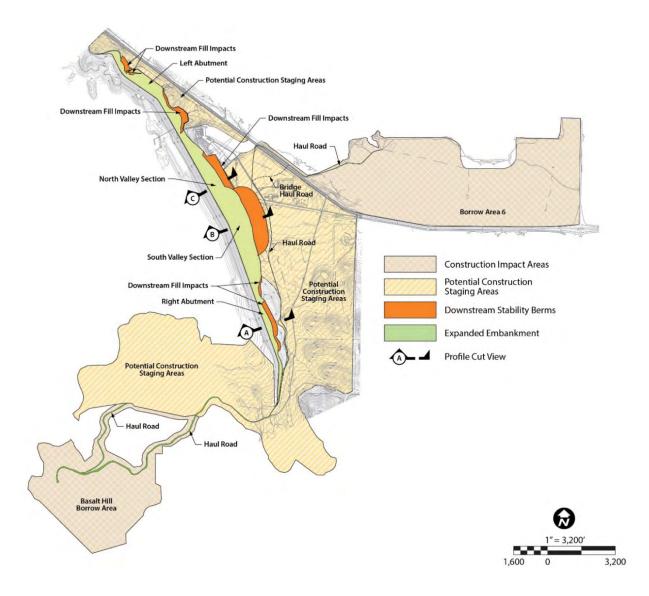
B.F. Sisk Safety of Dam Project Crest Raise Construction and Staging Areas
